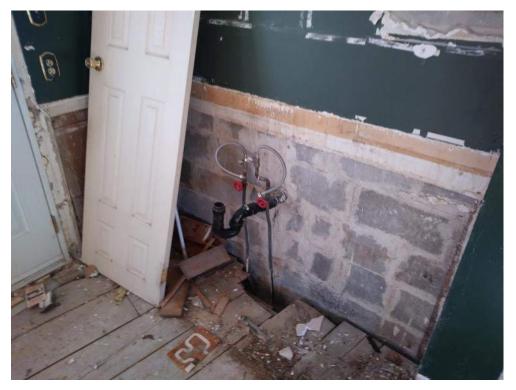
Plumbing fixtures in interior of 210 Prince Albert Street
